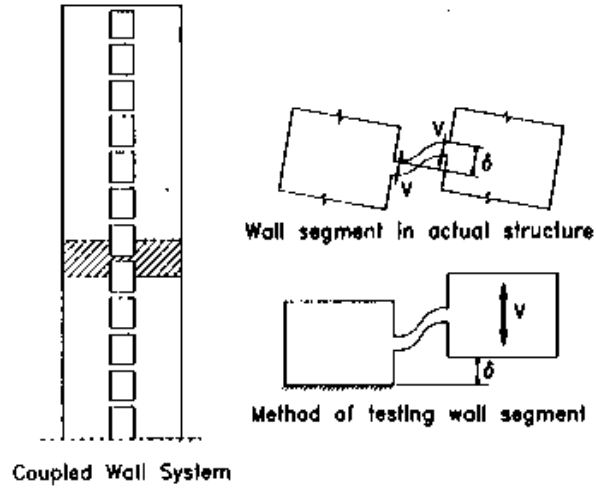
Coupled Wall Segment Tested by Harries et al. (1993)
